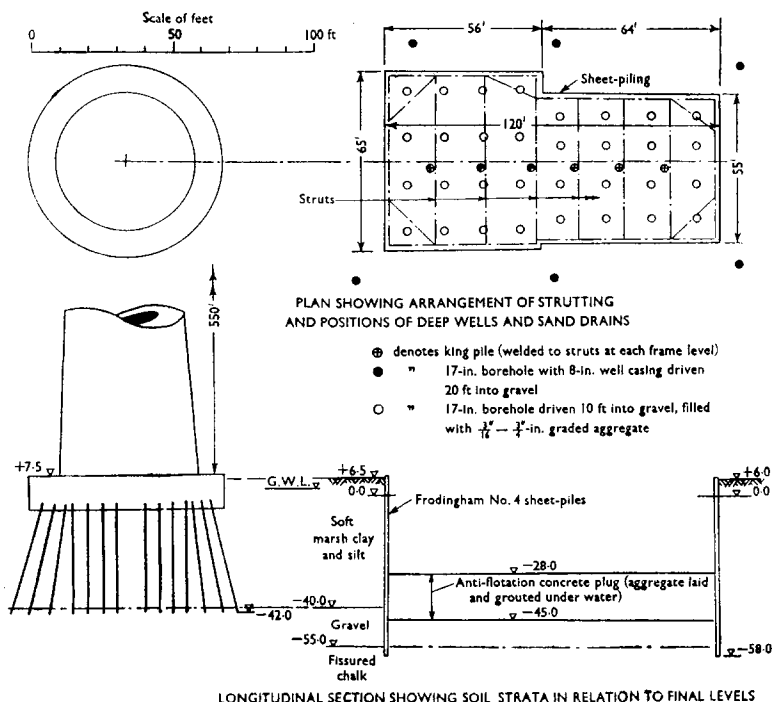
EXCAVATION FOR ASH-DISPOSAL PIT
